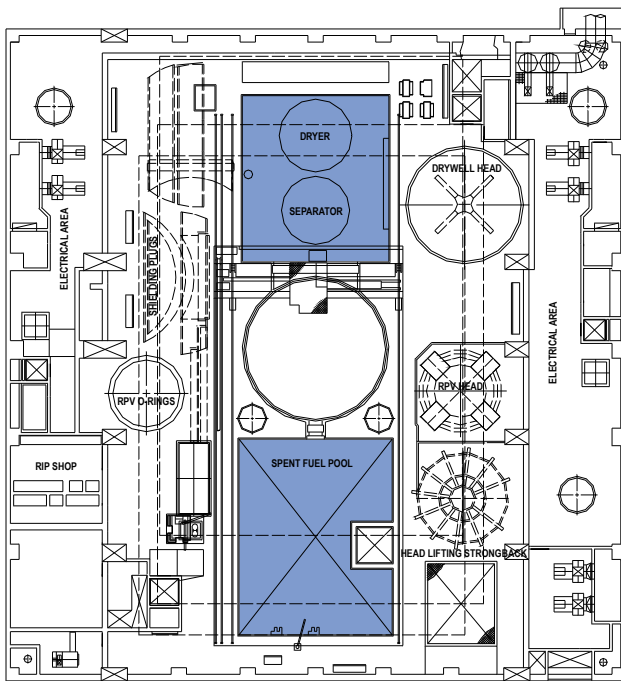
ABWR Reactor Building Refueling Floor Elevation
